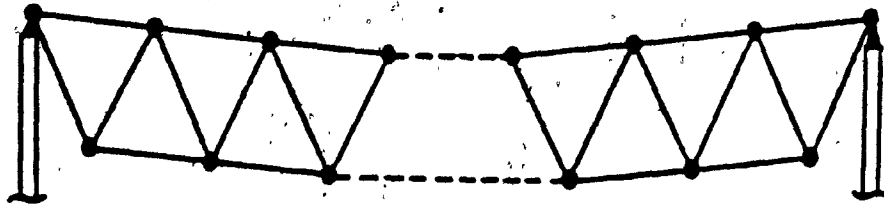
THE RING TRUSS PROFILE DROPS BELOW THE COLUMN HEIGHT. THE TRUSS HAS CONSTANT DEPTH AND IS SUPPORTED AT ITS UPPER SURFACE.
